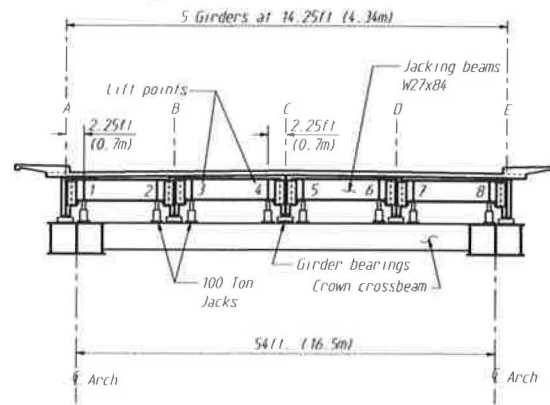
Crown crossbeam, jacking beams, and jacks.
